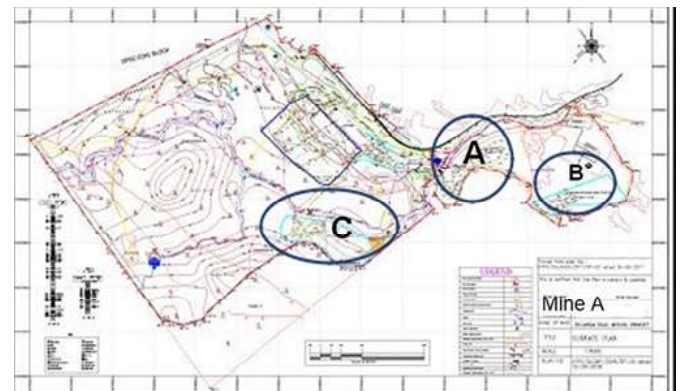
Mine Plan showing three number of existing dump at mine A
